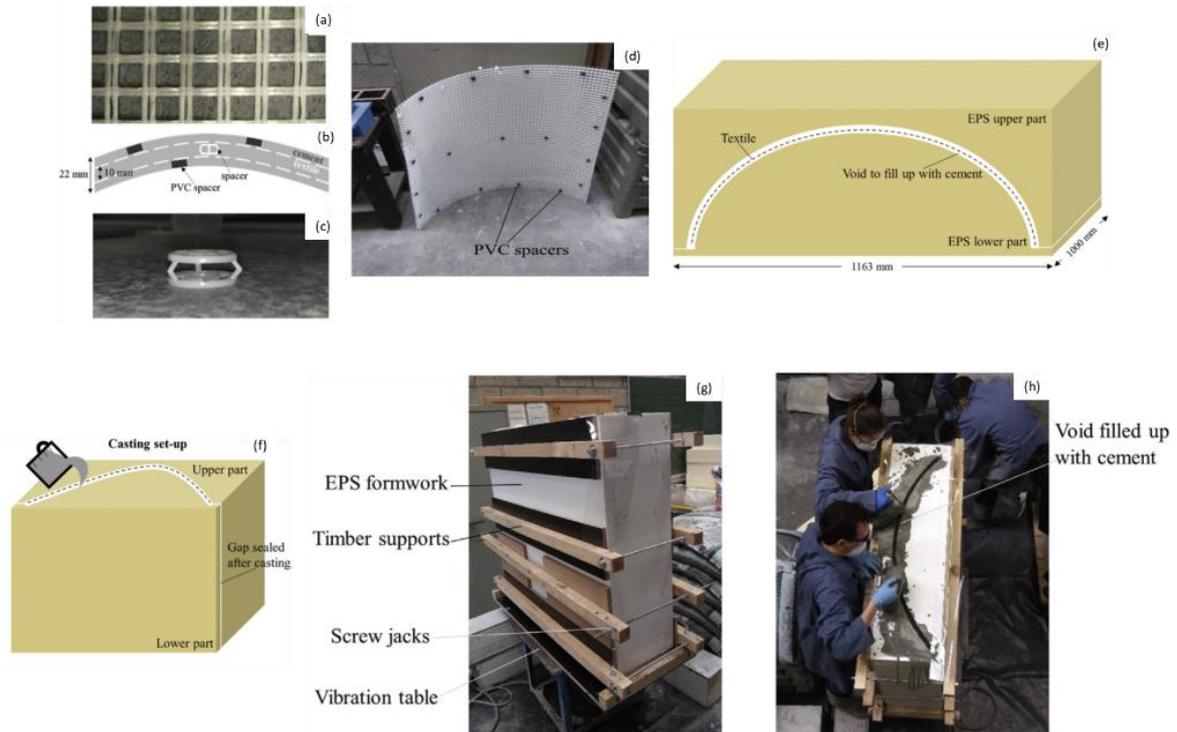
Sequential process demonstrating the casting of a TRC shell structure: (a) AR glass fabric, (b) Cross-sectional view of the shell element, (c) plastic spacers for maintaining consistent distance between fabric layers, (d) placement of PVC spacers to ensure uniformity between fabric layer and formwork, (e) two-piece formwork made from expanded Polystyrene (EPS), (f) vertical casting setup, (g) EPS formwork design with rebar-bolts system to control TRC thickness and prevent matrix leakage, (h) pouring of cementitious matrix into EPS formwork to cast TRC shell[54].
